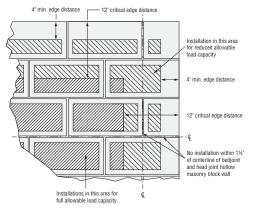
Stainless-Steel Titen HD Screw Anchor Installed in the Face of Hollow CMU Wall Construction
